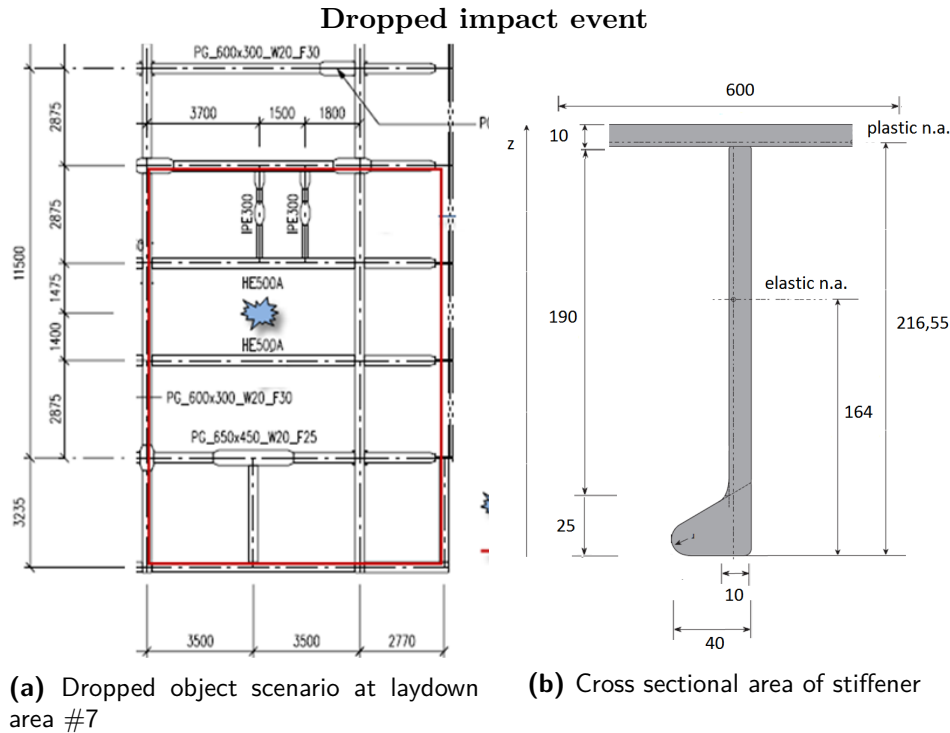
Stiffened Steel Plate dropped impact scenario
